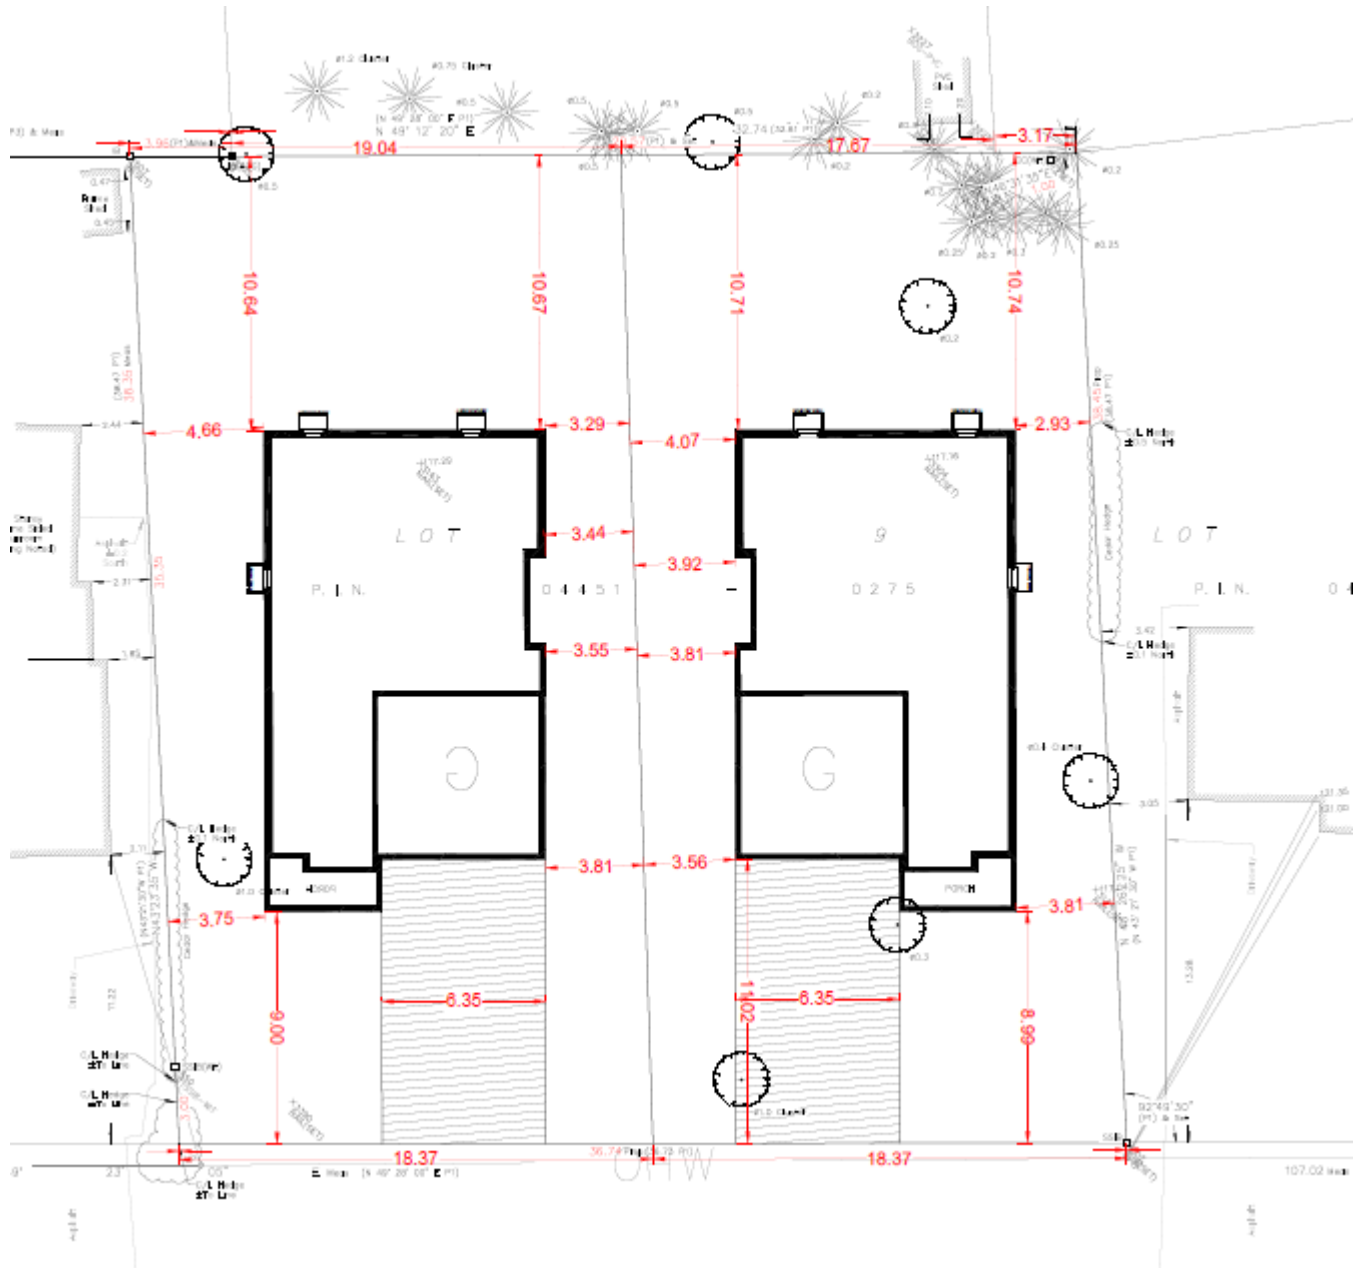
Conceptual Site Plan showcasing potential building footprint and setbacks
